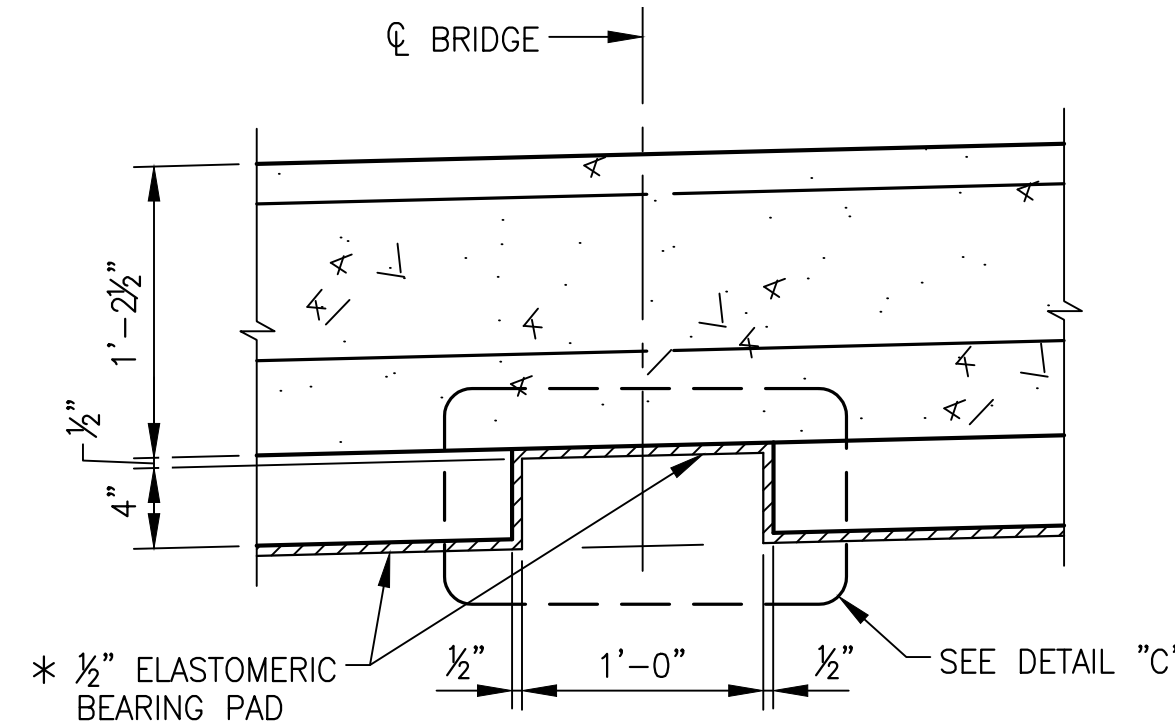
DETAIL SHOWING TYPICAL JOINT & HAUNCH
